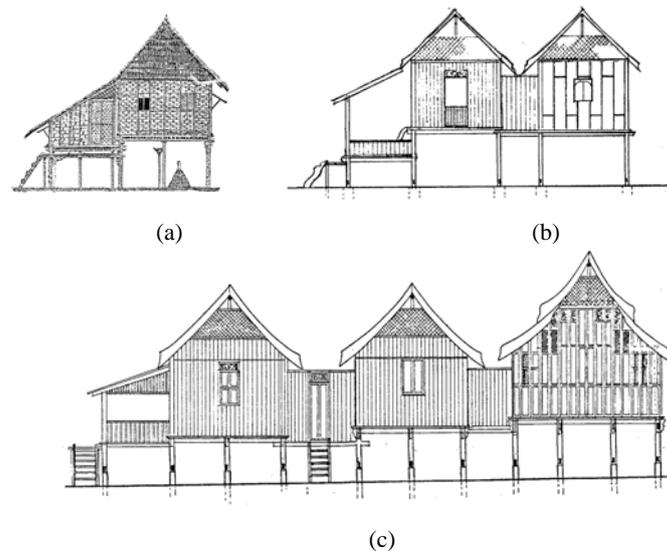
Examples of (a) 1-unit, (b) 2-unit and (c) 3-unit traditional Malay houses (adapted from Nasir, 1985).
